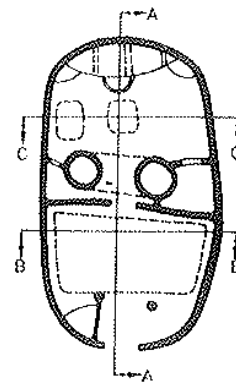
Floor plan, Jaba dwelling, North Central Nigeria. Source: Dmochowski (1988)
